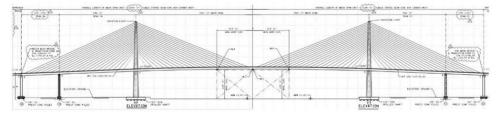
Cable-Stayed Main Bridge – Schematic Provided by Others
